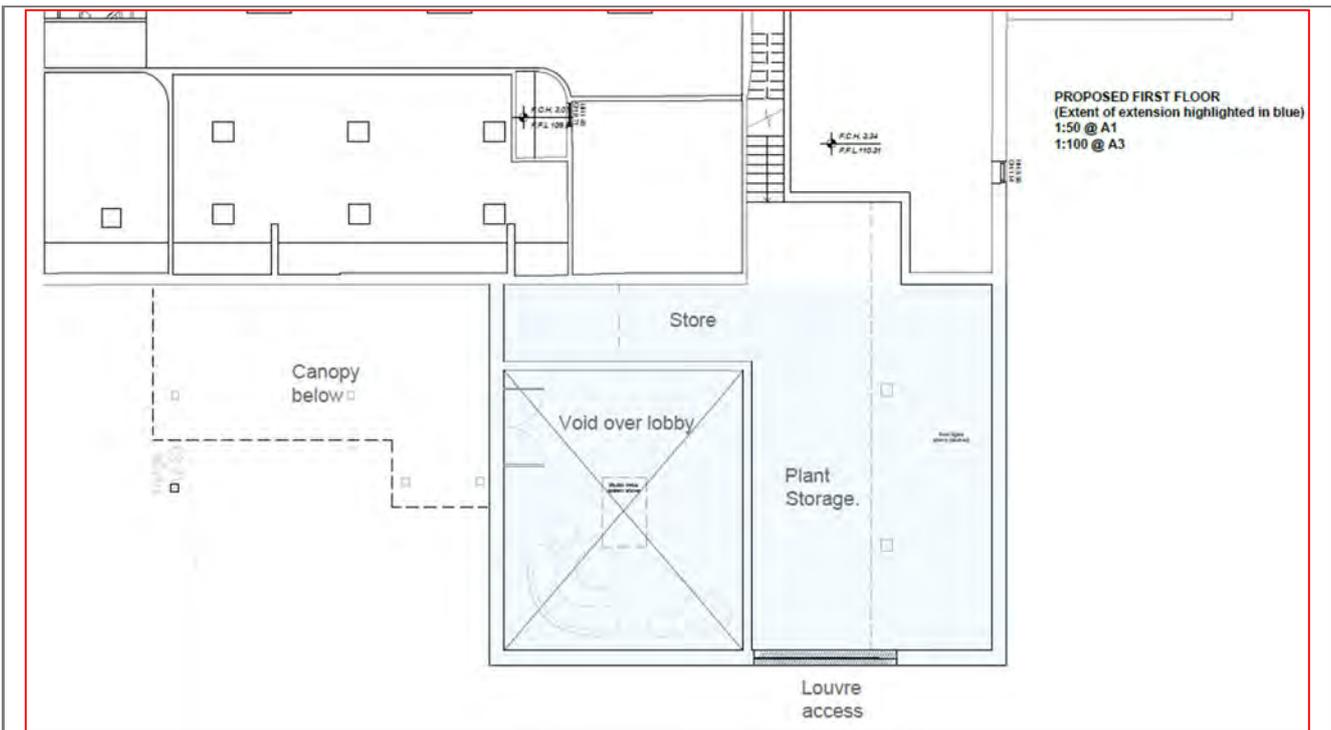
Option 1 Community Hall Proposed First Floor Plan
